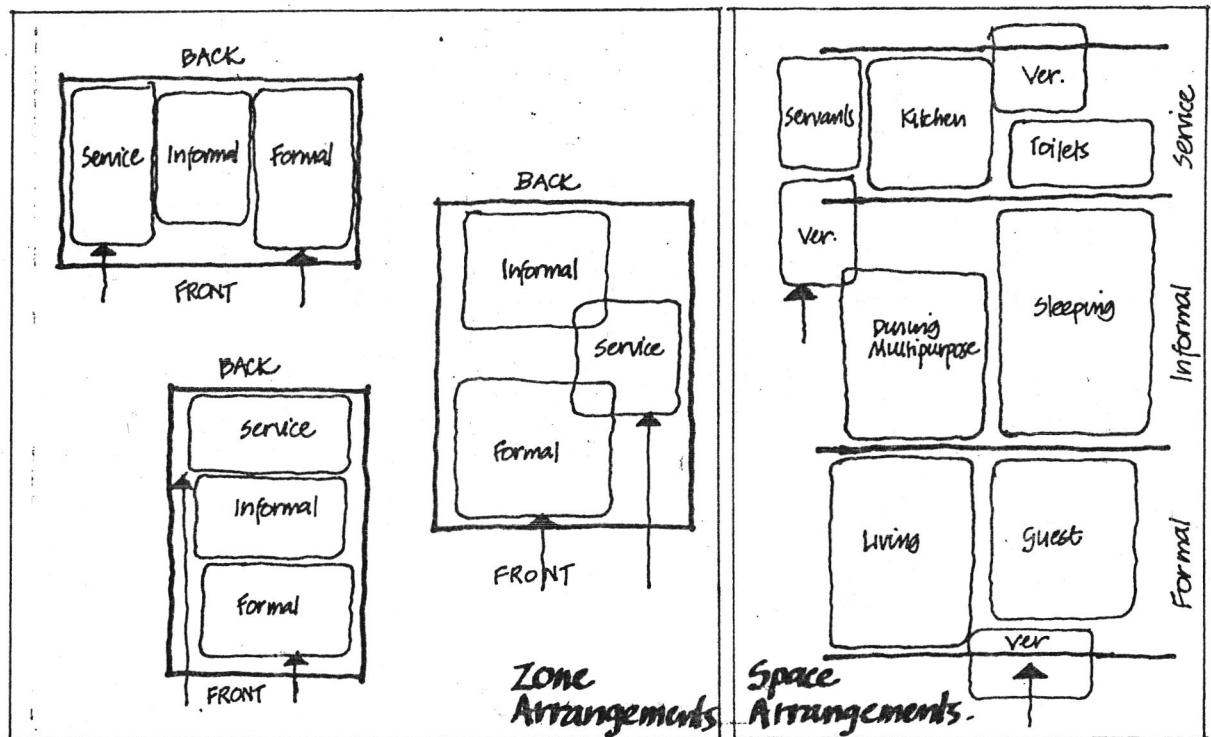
Zones in the house, front and back., space arrangements (after Mallick)
